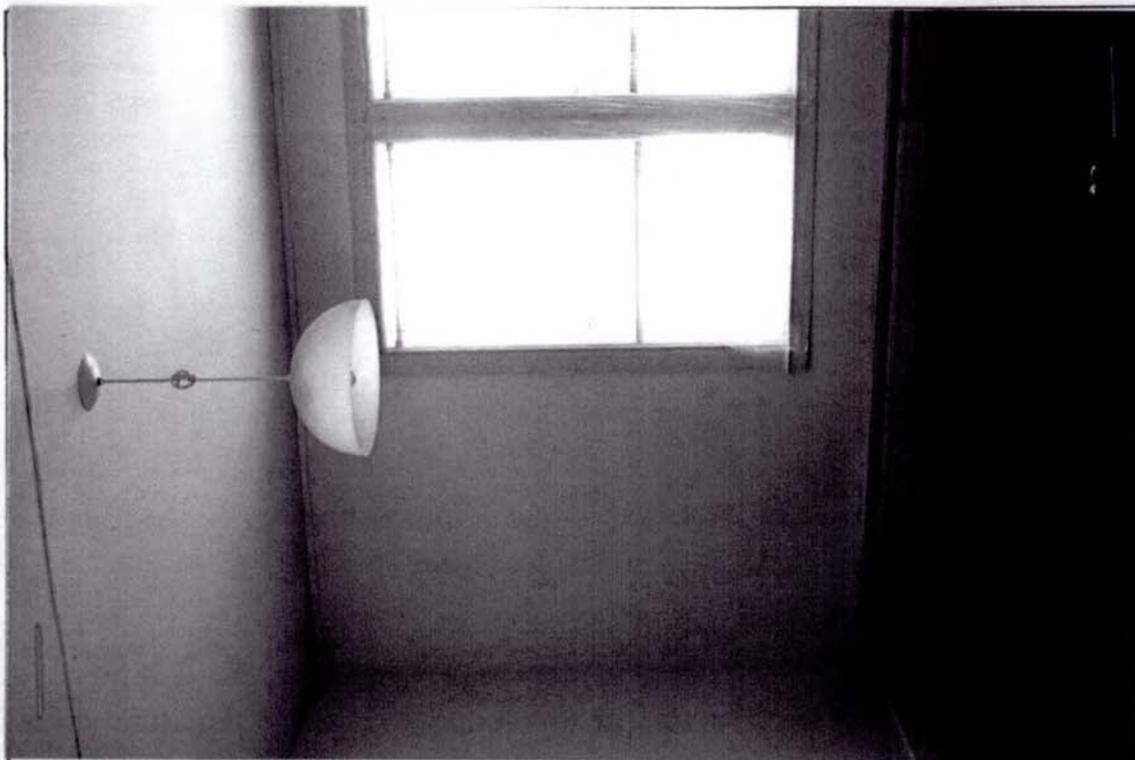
Description: Typical room at north side of first story of Wing/Connector
